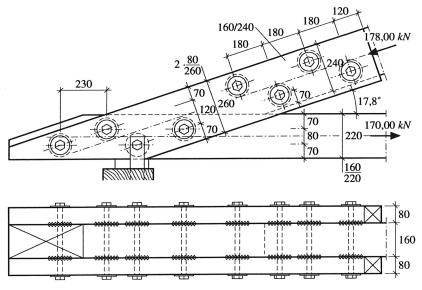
Toothed-plate connector heel joint; (O_1, U_1) .
